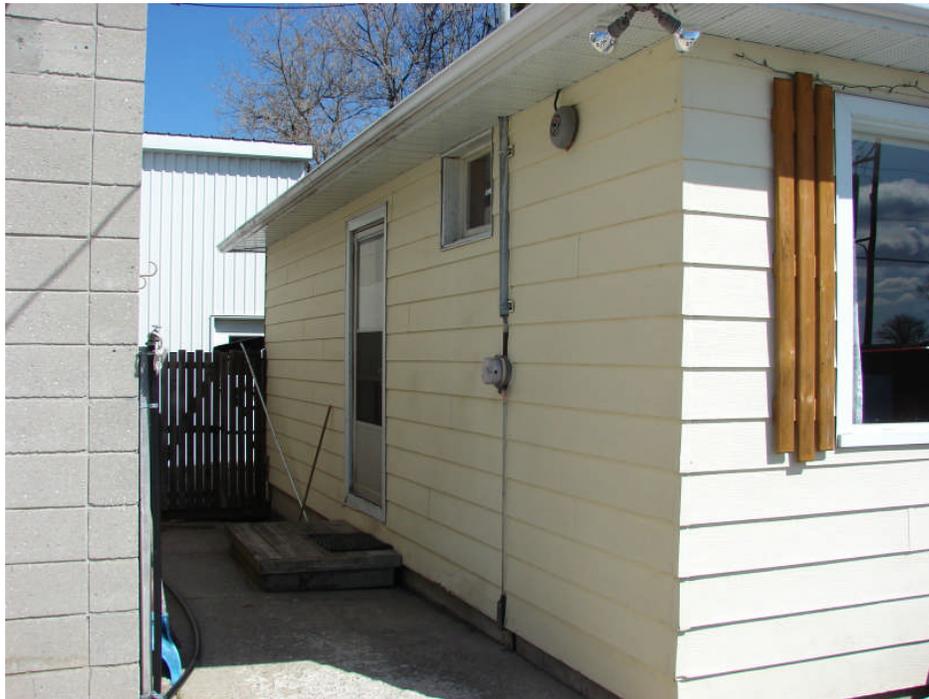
Residence south elevation – Aged and weather worn paint with peeling/blistering at wooden windows, typical.
